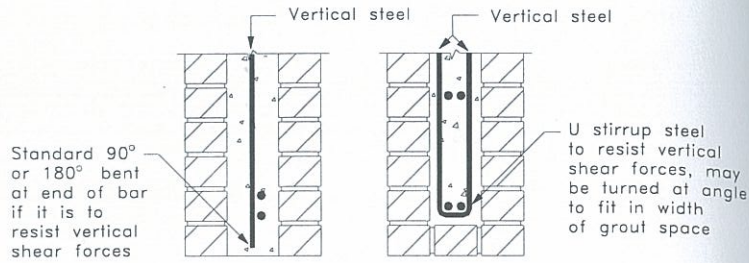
Vertical shear reinforcing steel arrangement for beams.
